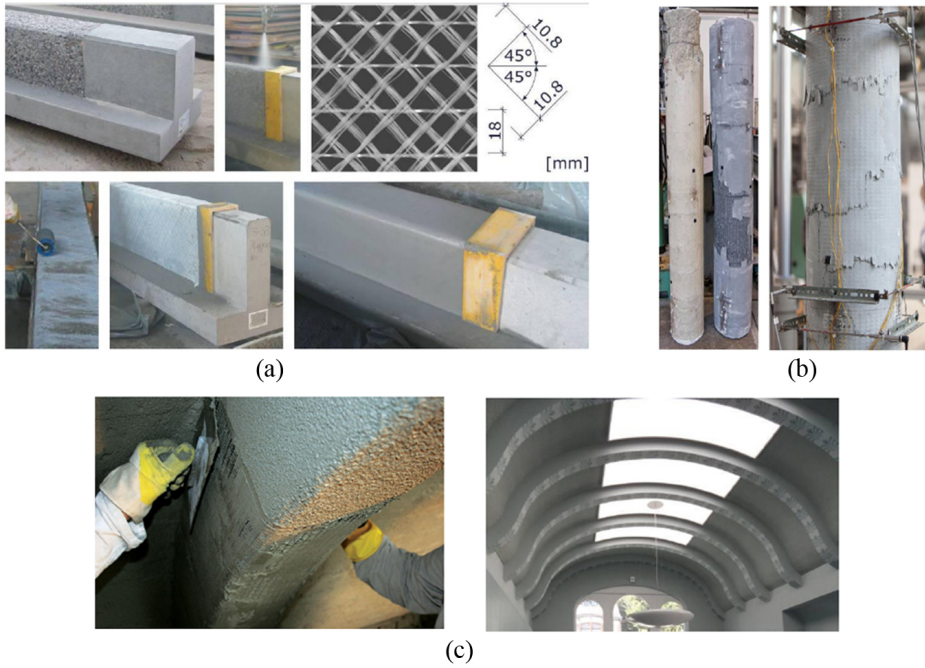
TRC used to retrofit a R/C beam (a), a R/C column (b) and a roof structure (c) [Curbach and Sheerer (2011)] .
